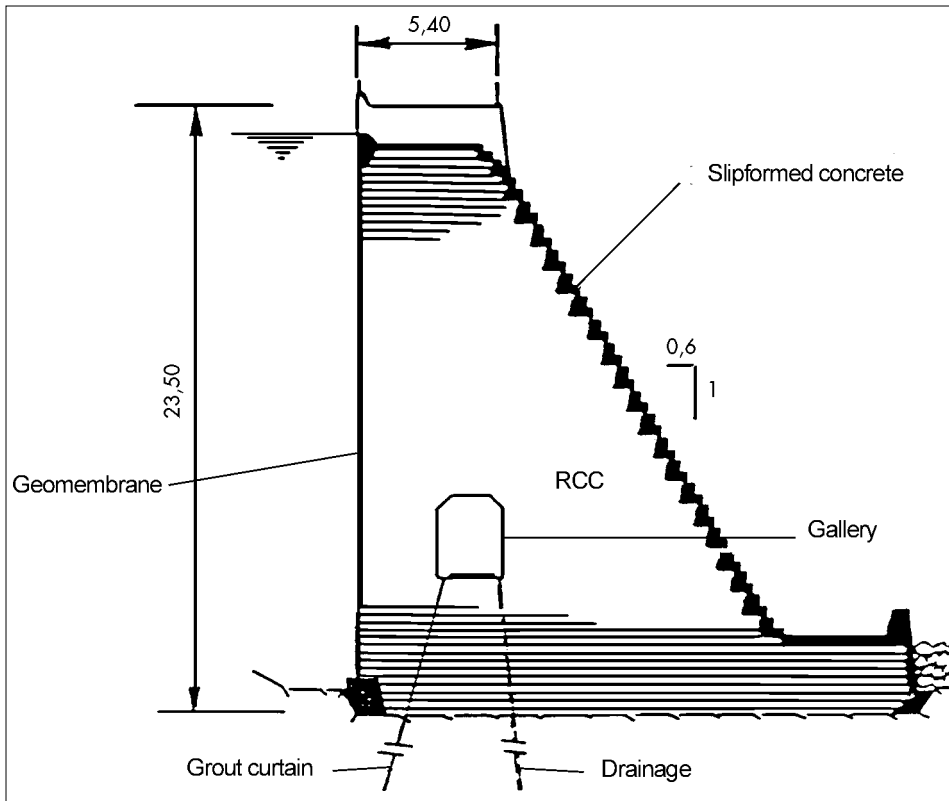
Typical cross-section of the Riou RCC dam - Faced with impervious geomembrane
